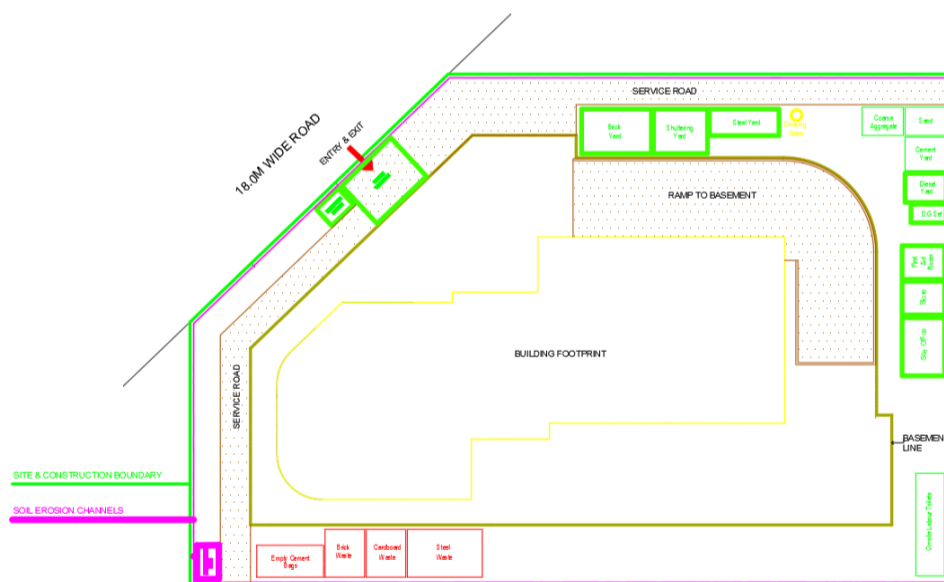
An example of a Construction Management Plan highlighting the location of construction materials.
